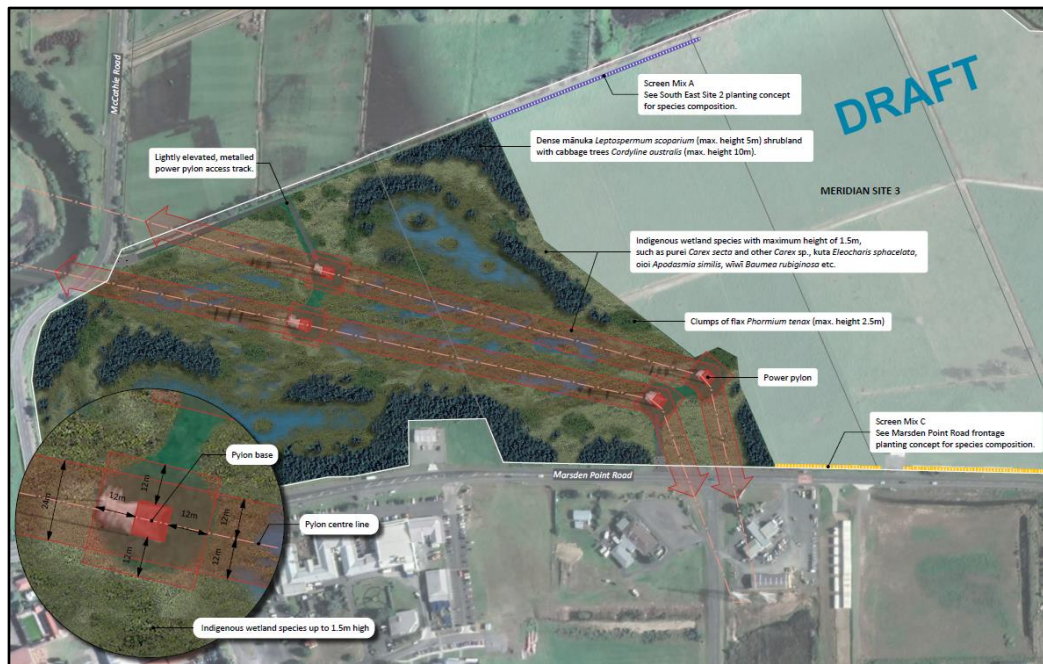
Landscape Planting Concept Plan (Source: LLA landscape assessment).
